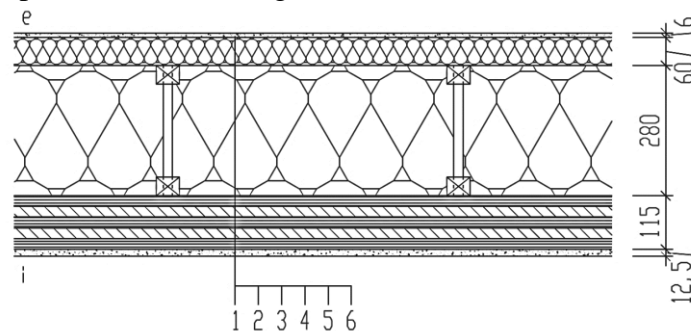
Composition of exterior wall constructions from MHM and lightweight ladder beams.
